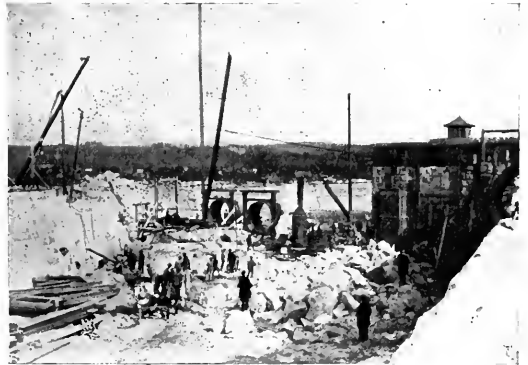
LAYING FOUNDATIONS FOR ADDITION TO POWER HOUSE.
